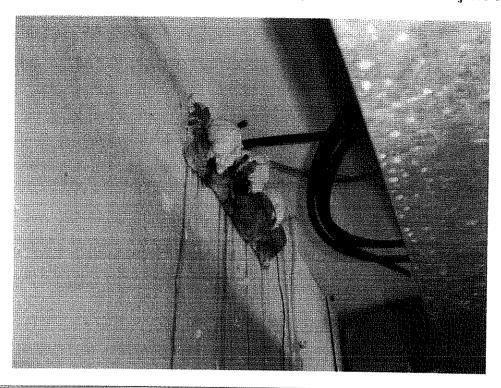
View of wall penetrations through the exterior wall. Note: There is visible evidence of past water intrusion.
